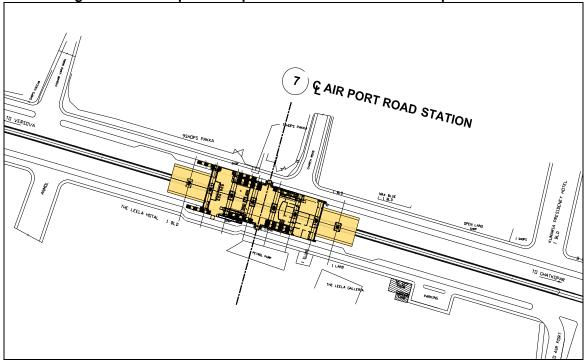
Proposed Airport Road Station Area Development Plan
